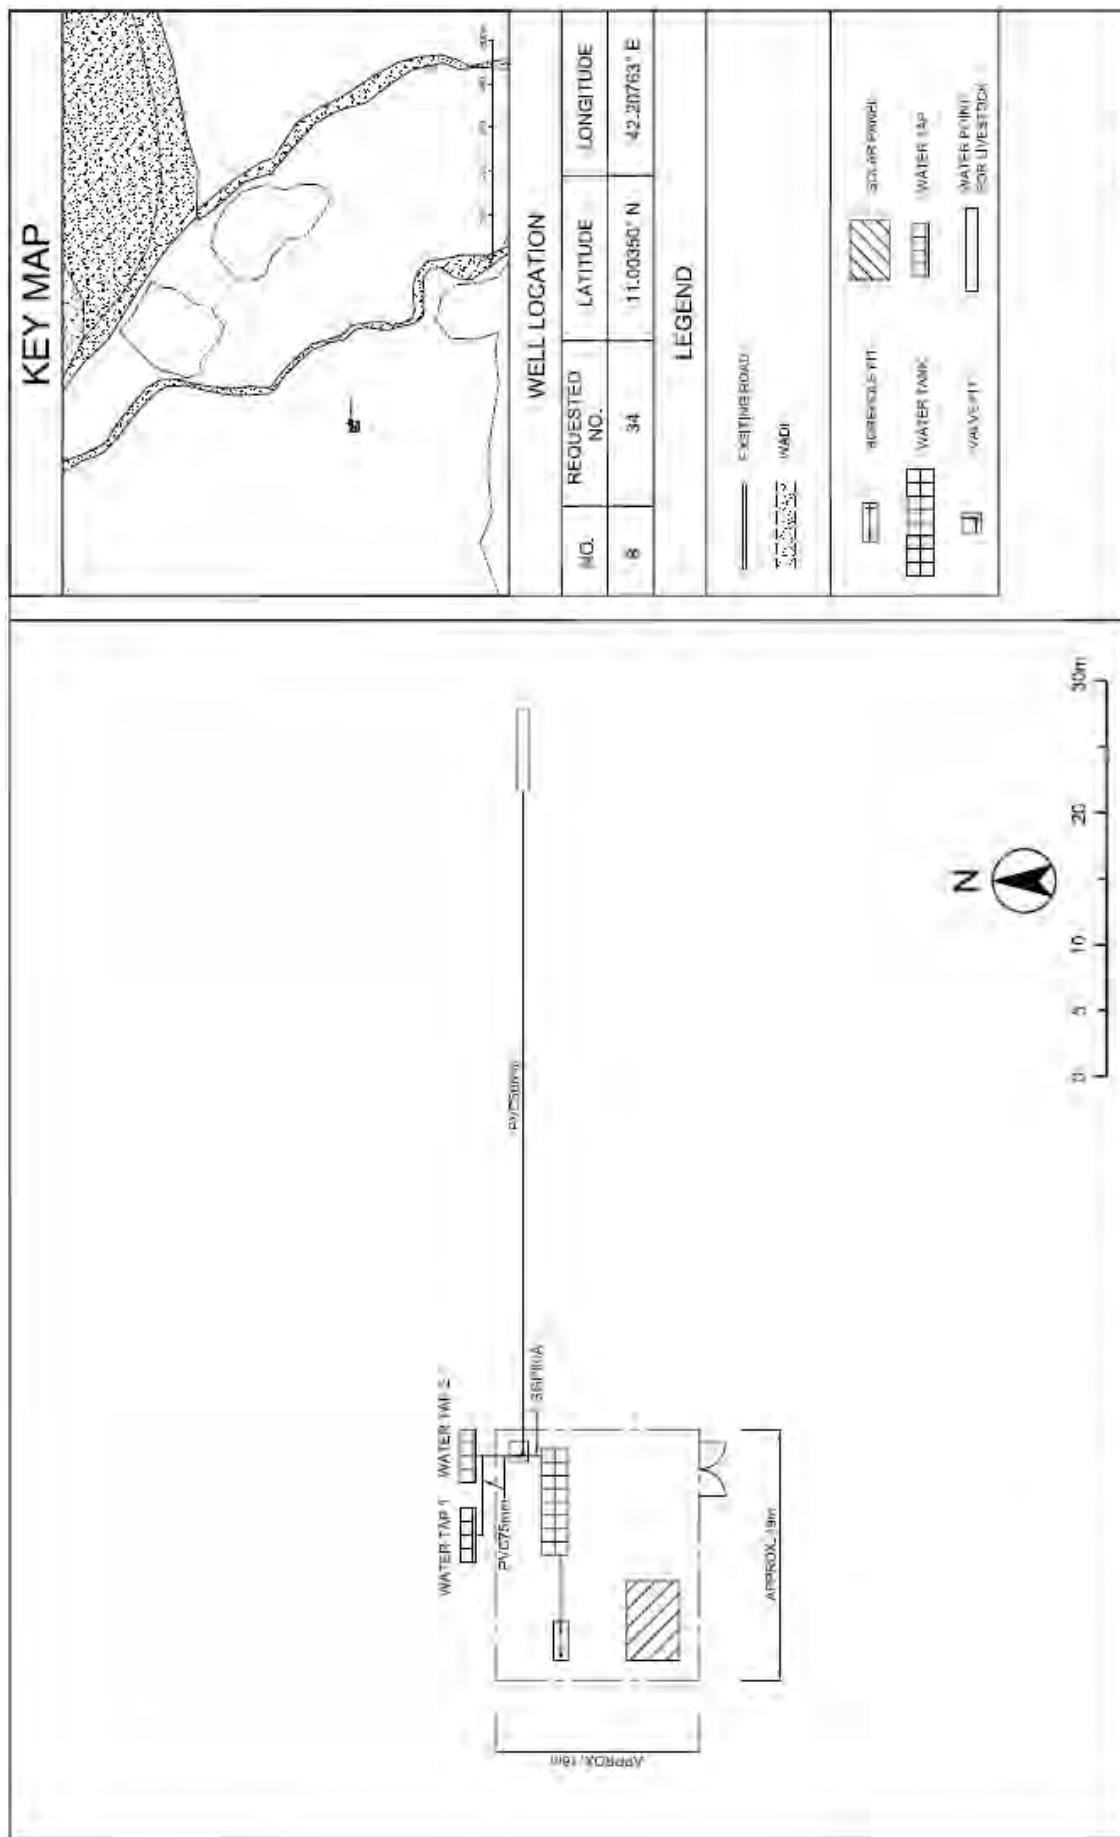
Layout of Facility (1) [Sabbalou (Sankal)]
